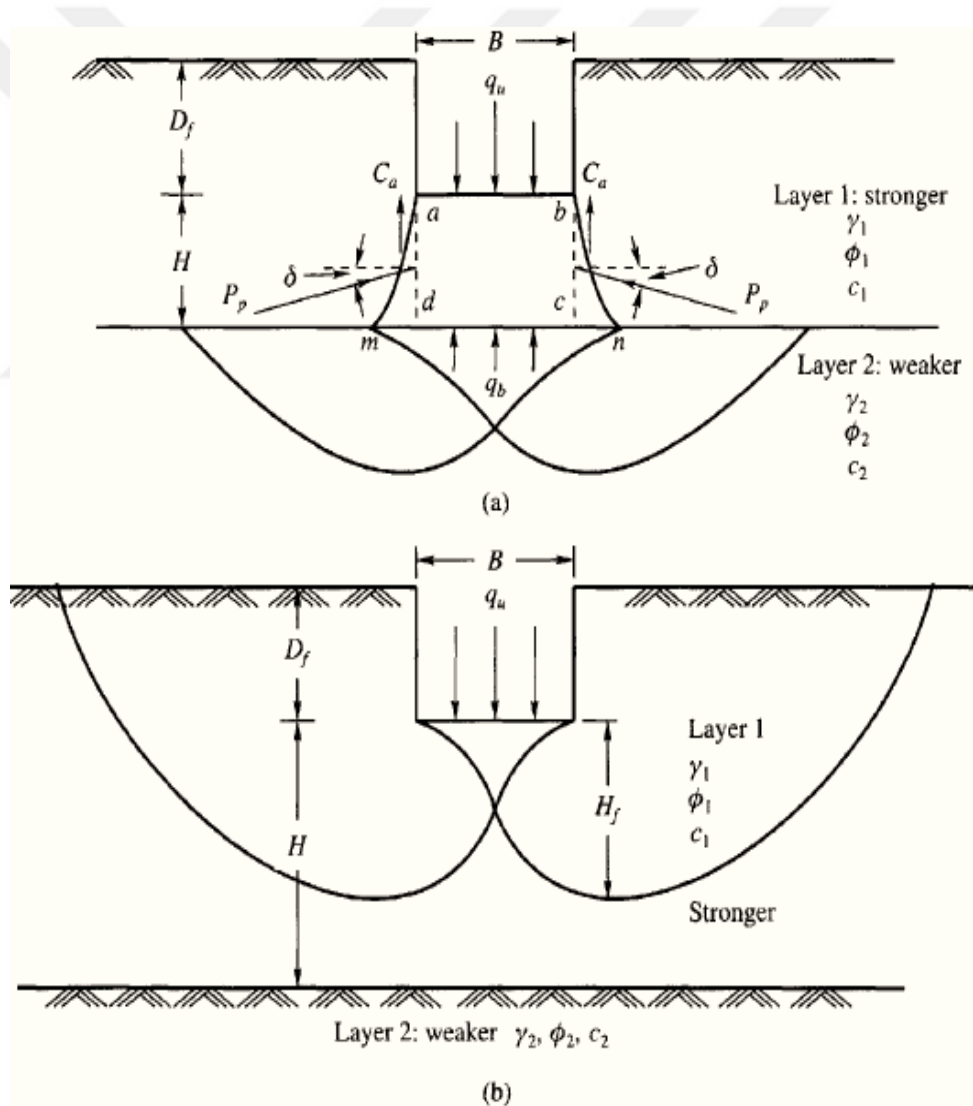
Failure Of Soil Beneath Strip Footing Undergo Vertical Load On Strong Layer Resting On Weak Layer
